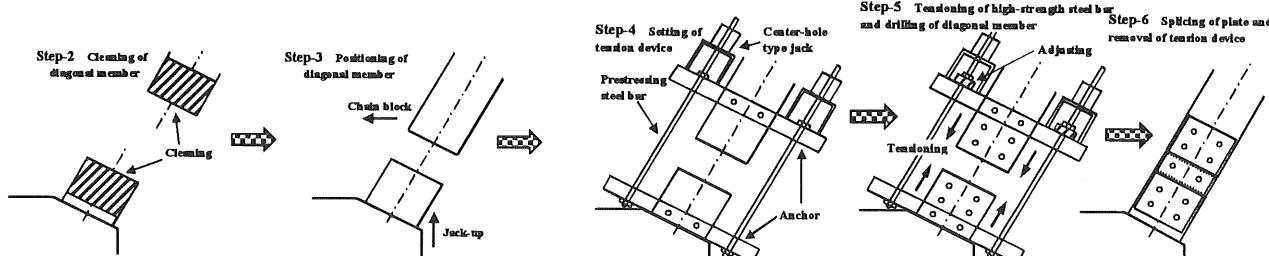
A new retrofit and strengthening method with adjusting axial force of diagonal member.
